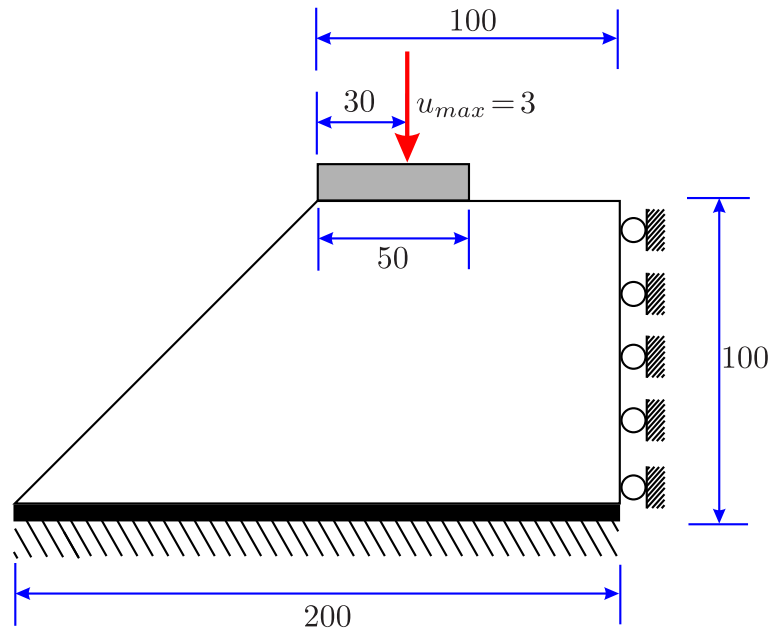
Geometry, boundary condition and loading for the footing loaded on a slope problem
